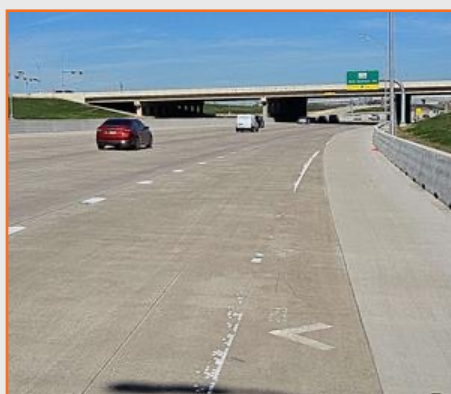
SRT pavement marking damaged or missing NBML near FM 544/Parker Rd.
